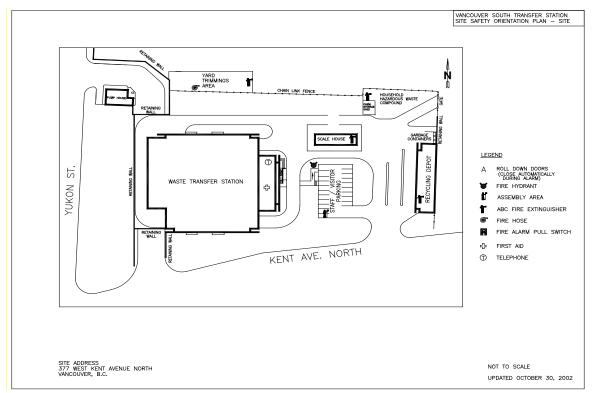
Vancouver South Transfer Station, Site, Plan View
